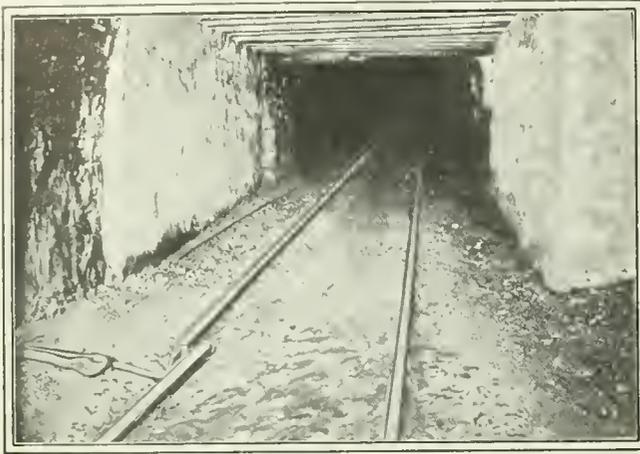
SHOWING CONSTRUCTION OF OVERCAST, ALSO DERAILING SWITCH
